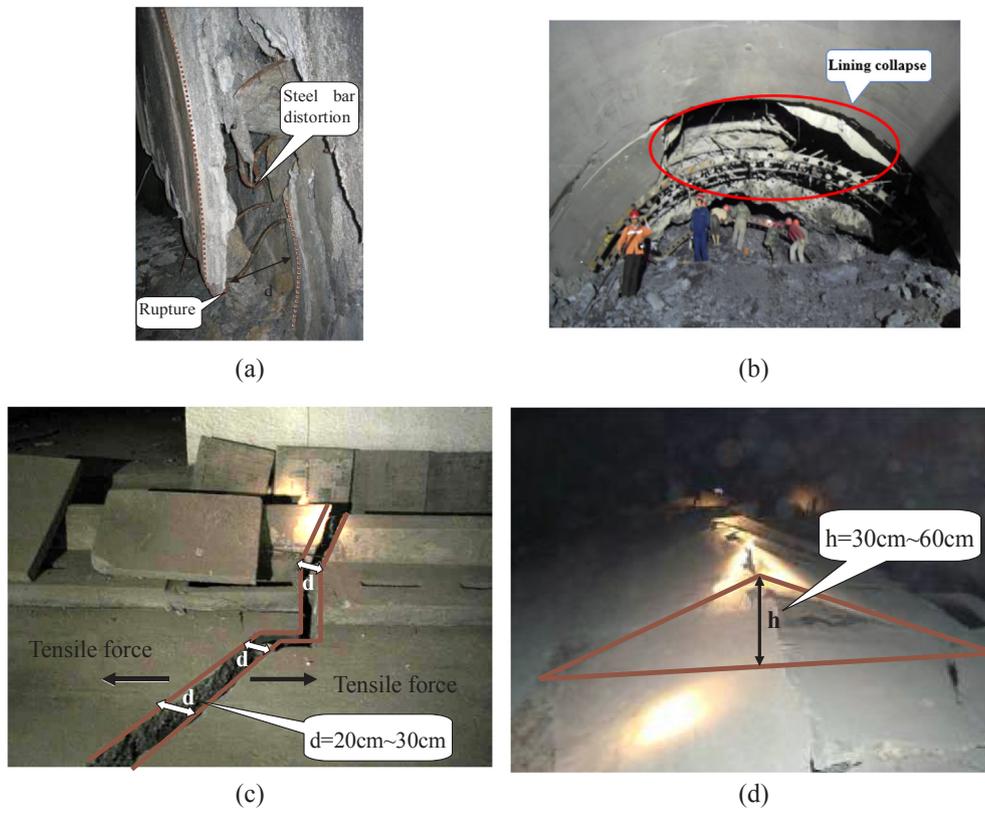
Damage patterns of tunnel lining in Longxi tunnel. (a) Rupture of Longxi tunnel lining; (b) Tunnel lining collapse; (c) Transverse shear fracture; (d) Longitudinal uplift for pavement.
